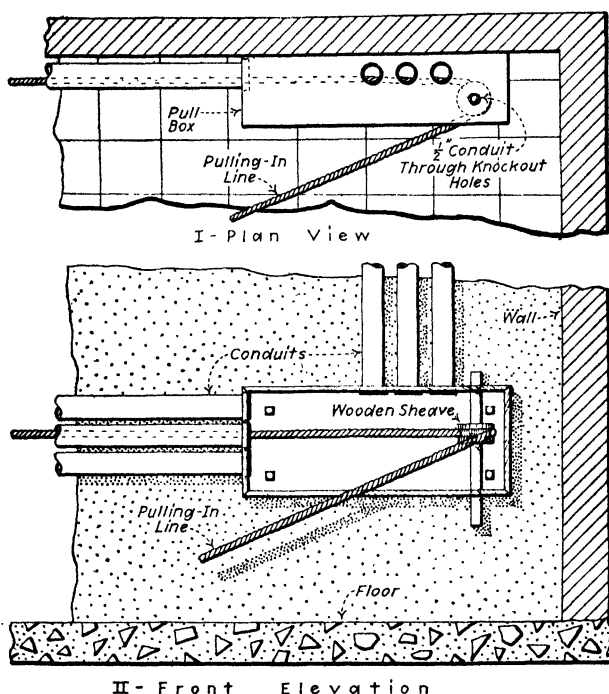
Sheave for pulling-in line in confined location. This method is particularly applicable where the pull box or outlet is located in a corner and a direct longitudinal pull is impossible. (The electrician should plan in advance and have the knock-out holes to support the axle punched in the pull box when it is being made.)
